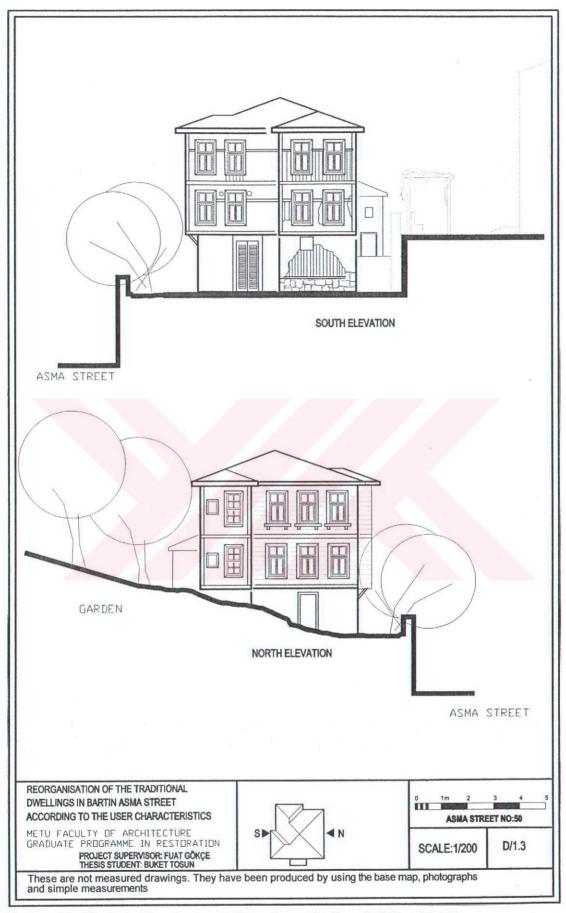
Sketch Drawings of Facades of the Building No:50
